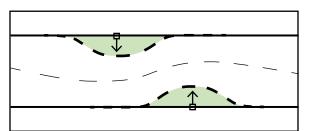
At the mid-block of a street, stormwater curb extensions can have be symmetrical or staggered orientation.
